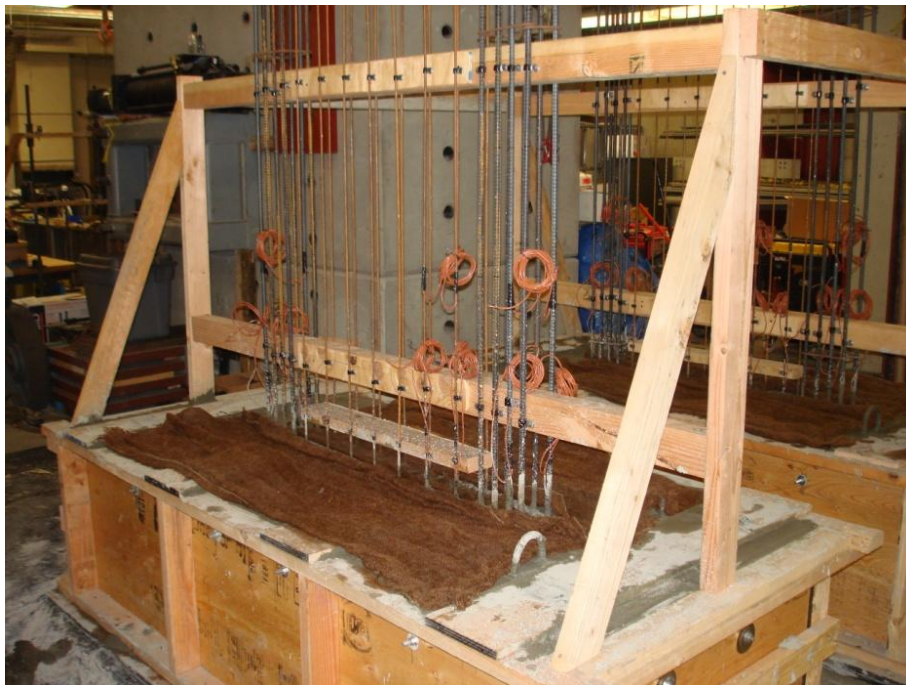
Pouring and curing the concrete for the foundation blocks
